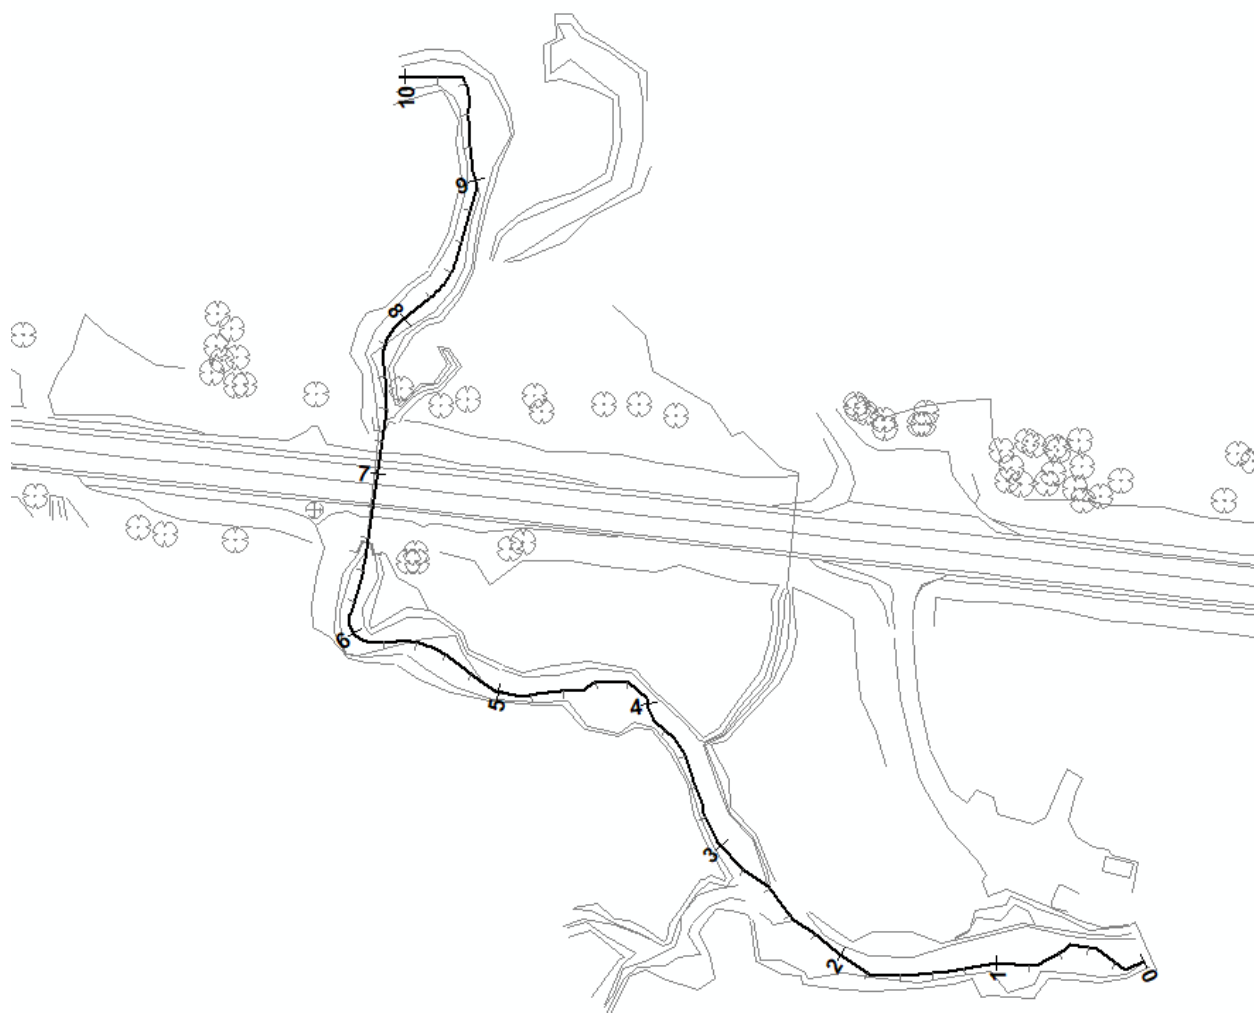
Longitudinal profile stationing for existing and proposed conditions
